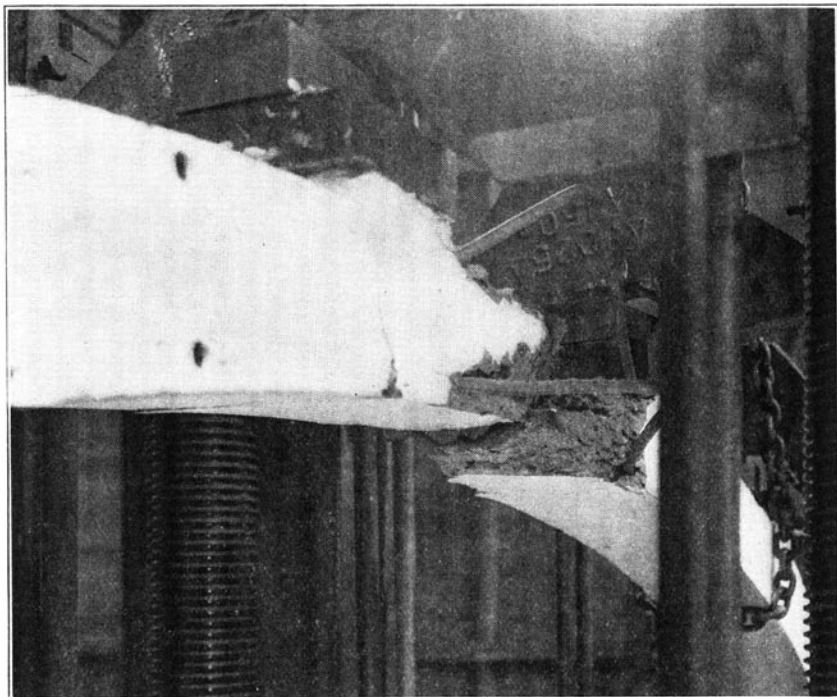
FAILURE OF ARCH 26-1 AT CROWN
